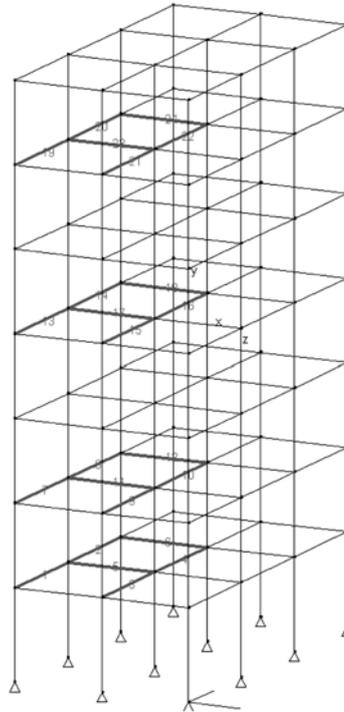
(a) Seven storey space steel frame F' with considered beams
